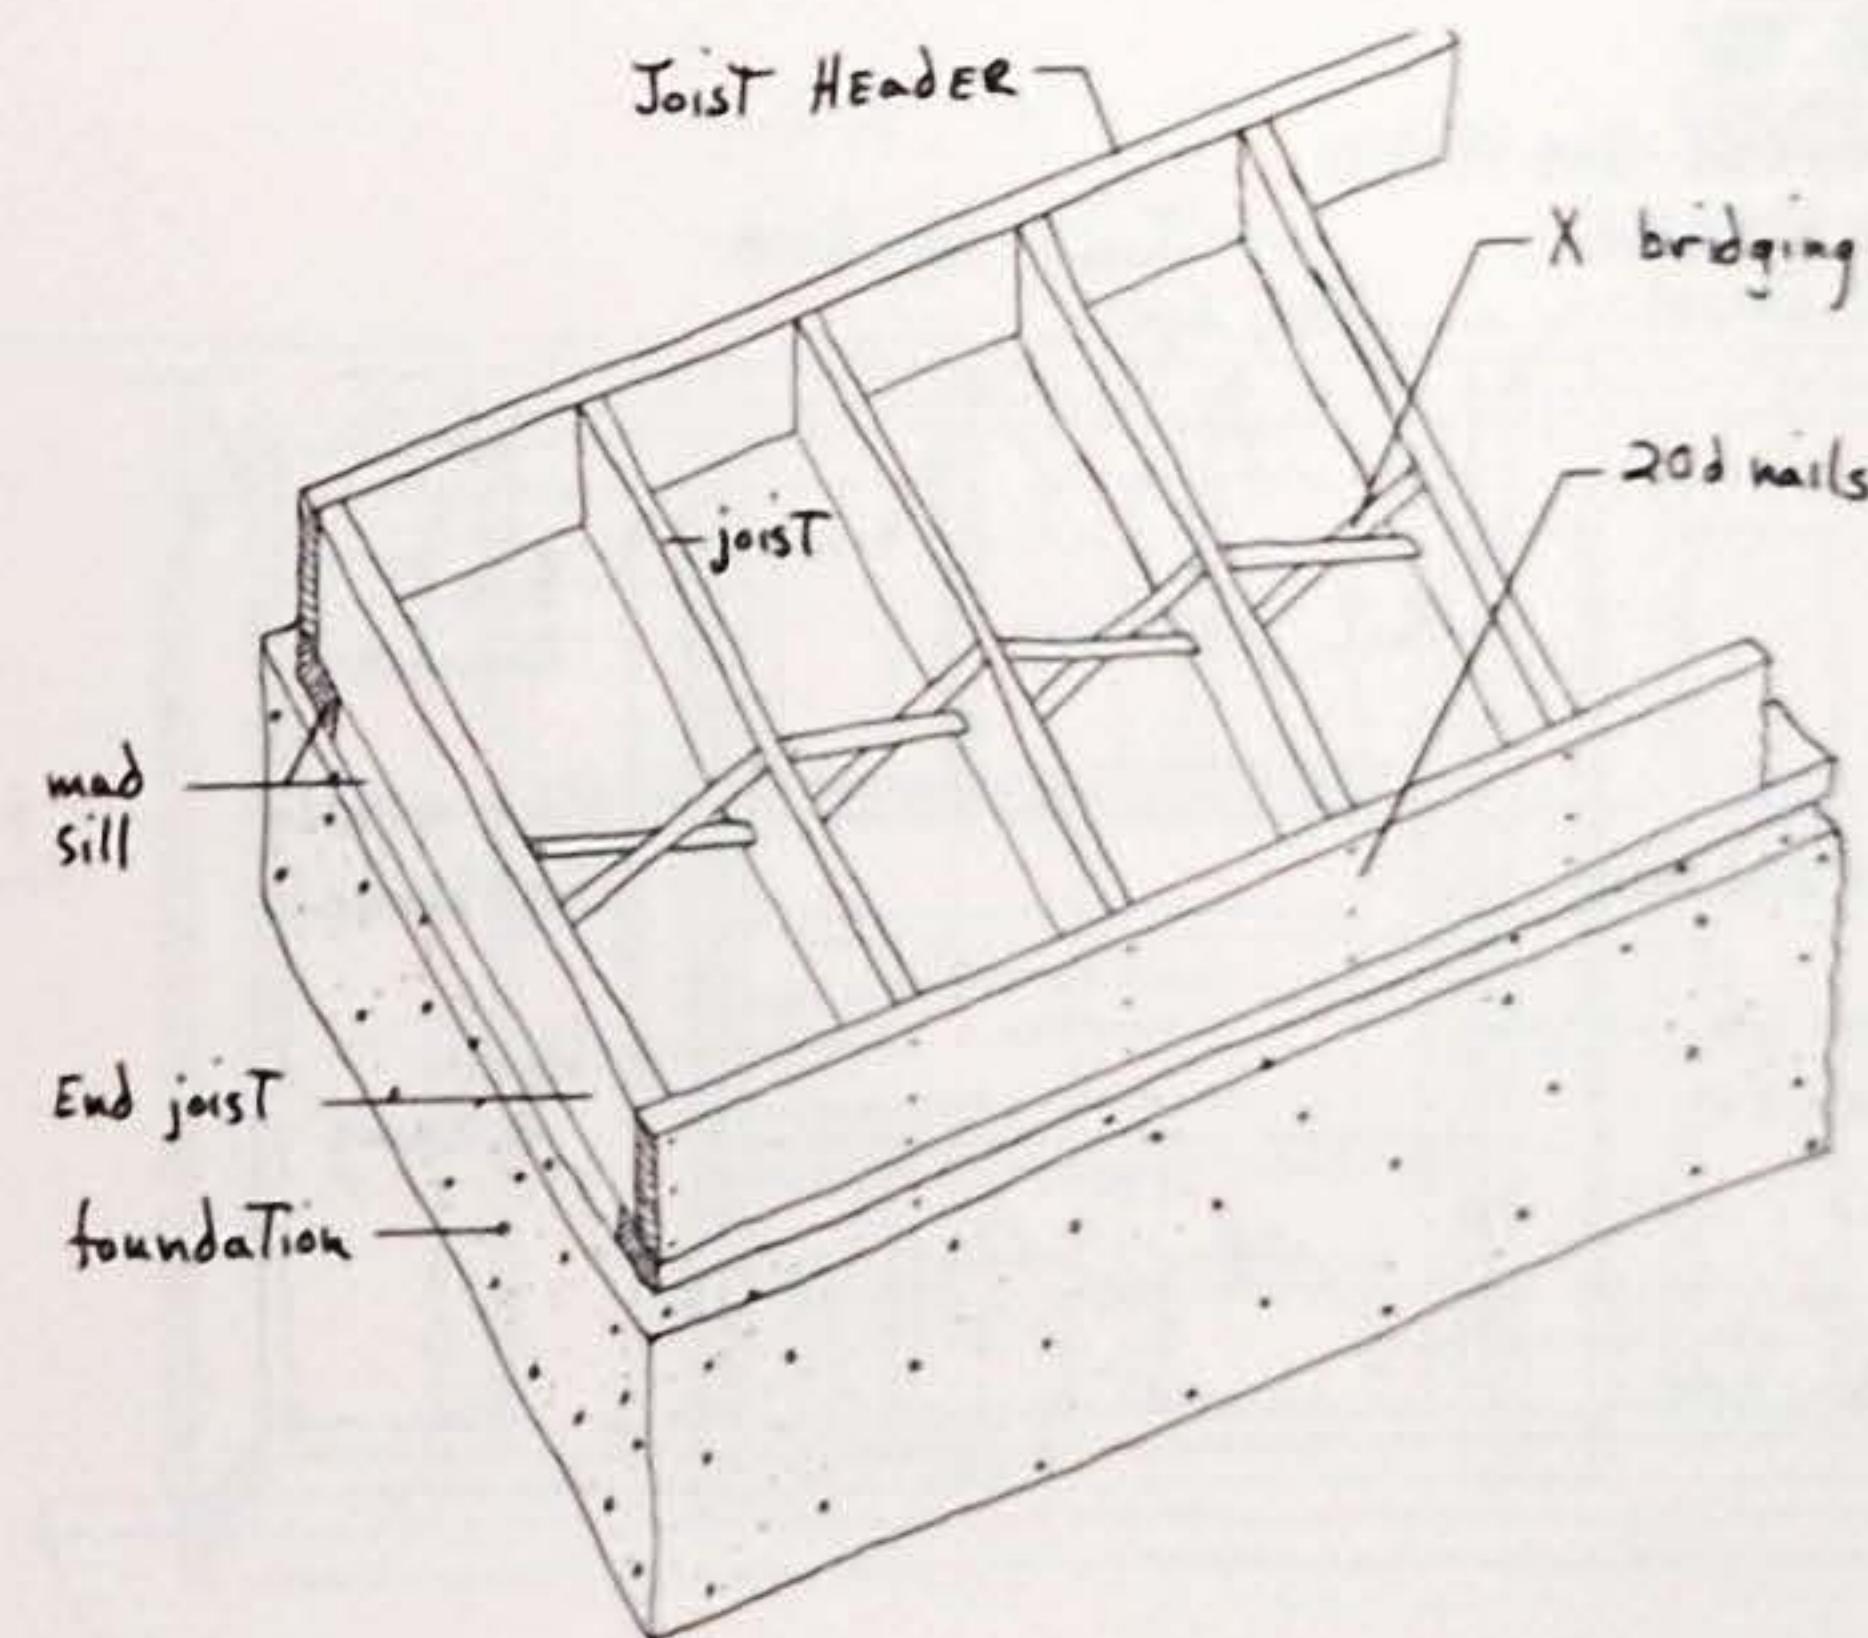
JOIST STRUCTURE Bearing on foundation
